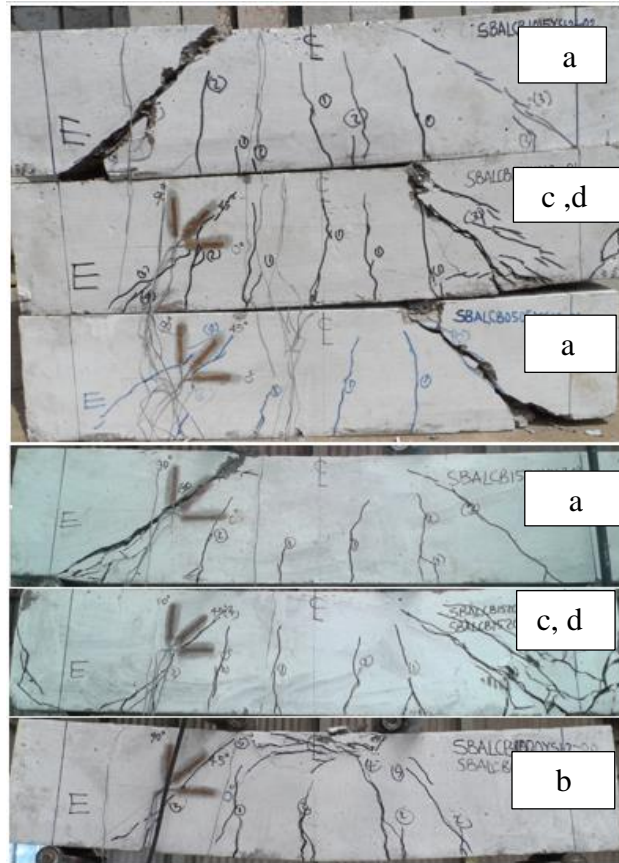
Failure pattern of 1.2m beams with shear reinforcement
